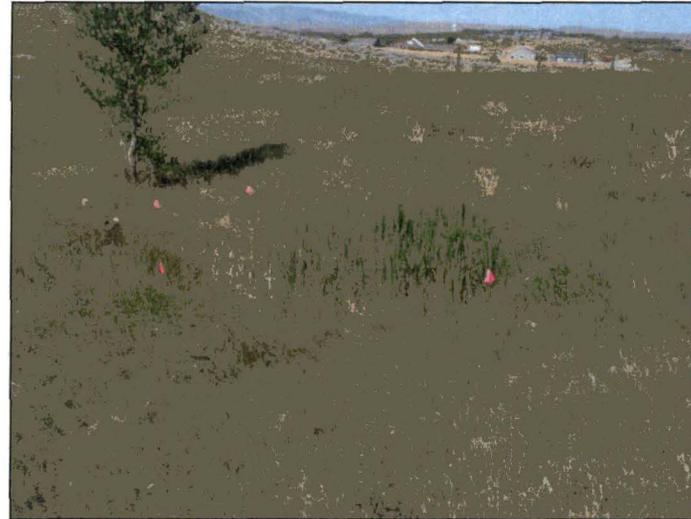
Site 12 - Sta. 1198+05, right (Data Points DP 11/DP12). Westerly view of small shallow marsh/wet meadow at culvert.
